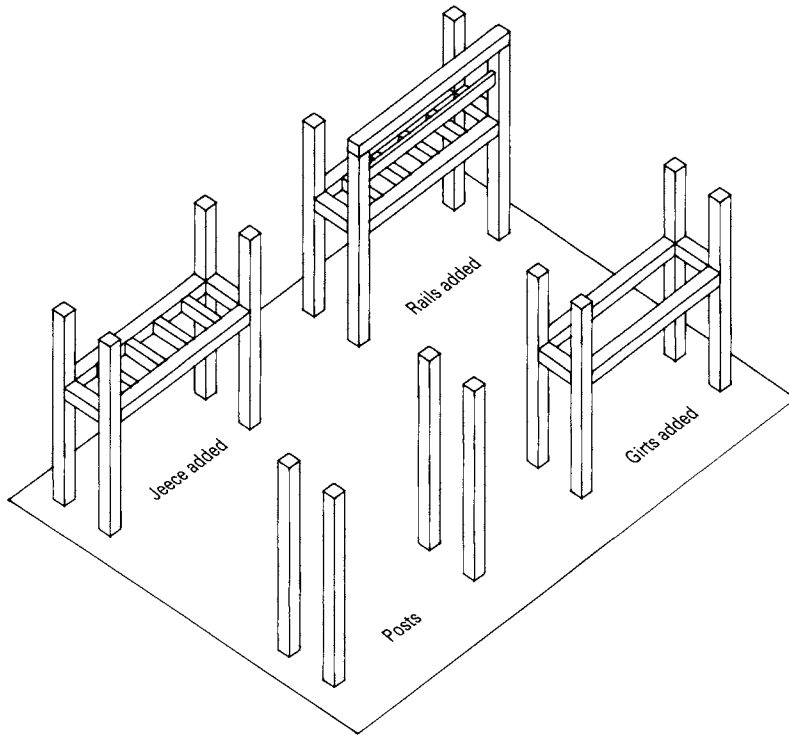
Demountable stage construction, typical disposition of essential timbers.
